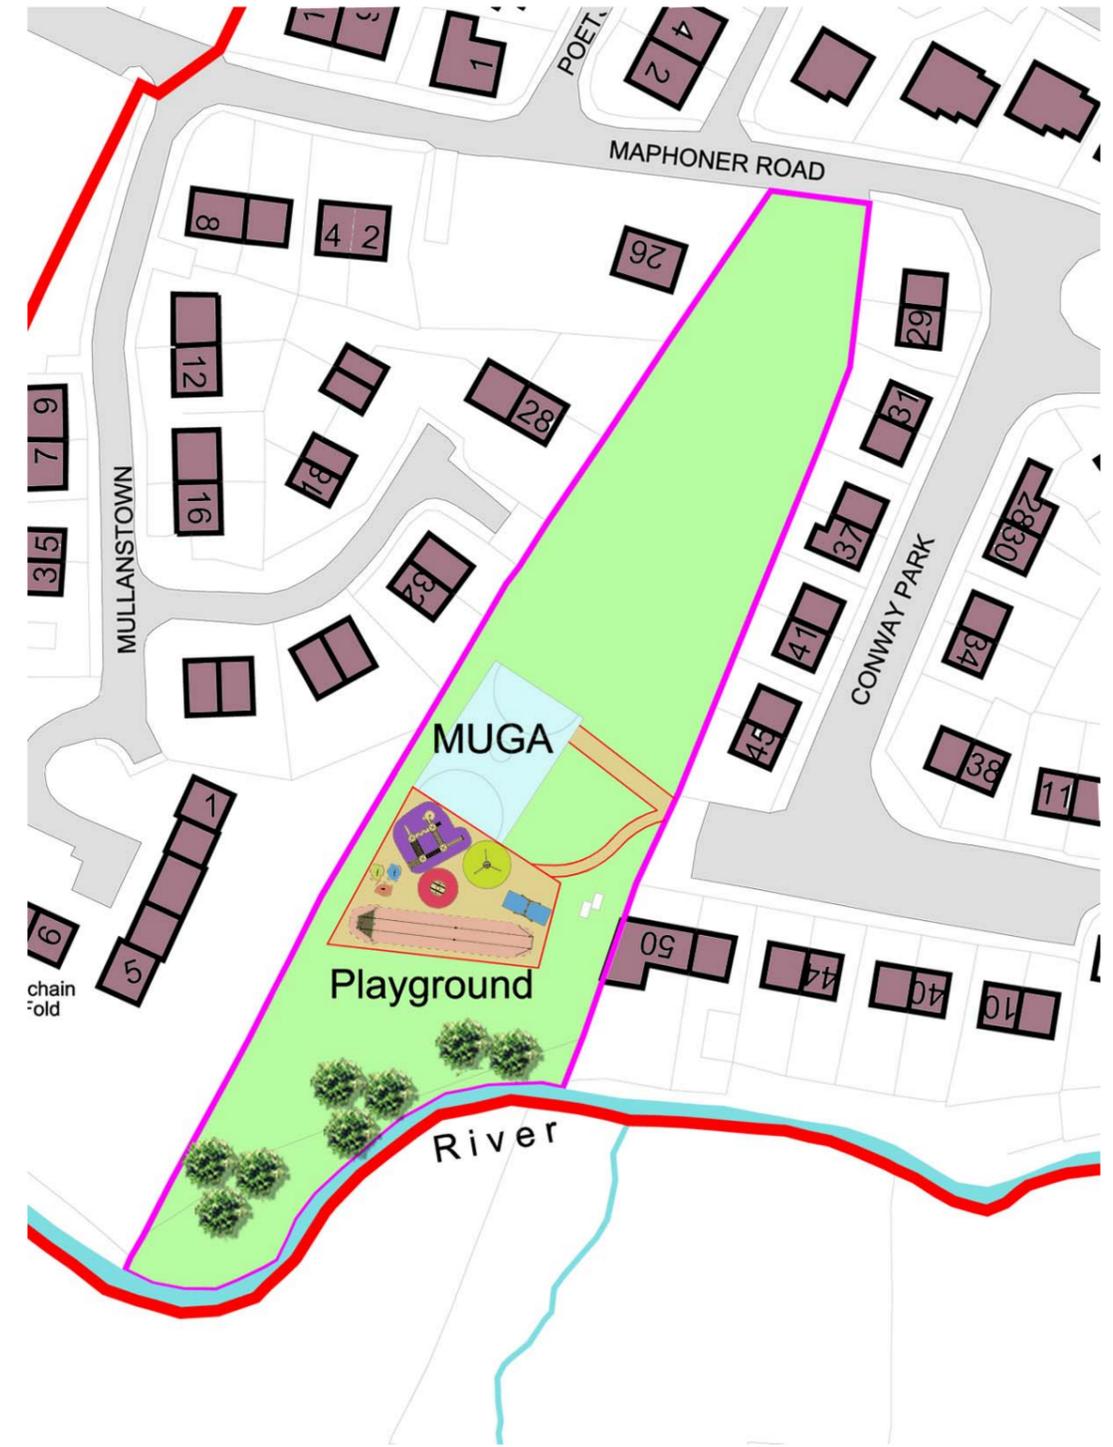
Indicative image showing new play equipment and tree planting to soften up the play park
